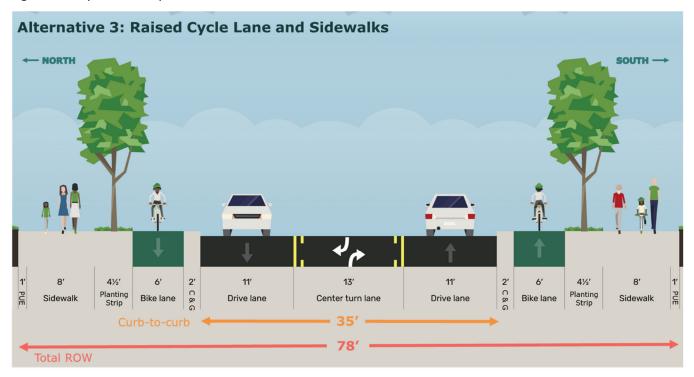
FARMINGTON ROAD CORRIDOR - ALTERNATIVE 3: 3-LANE CROSS-SECTION WITH RAISED CYCLE LANE AND SIDEWALKS (BLTS= 1, PLTS= 2)
